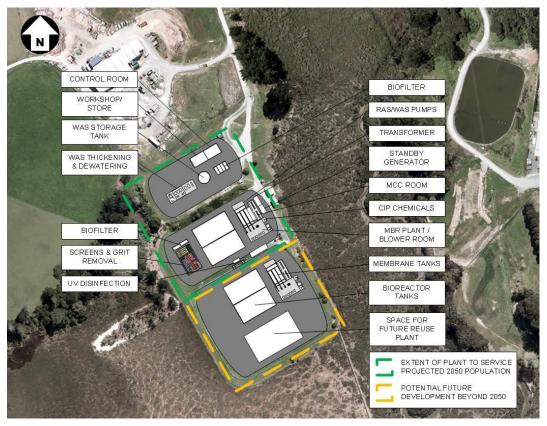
Possible layout of 50,000 PE plant at existing Snells-Algies WWTP site
